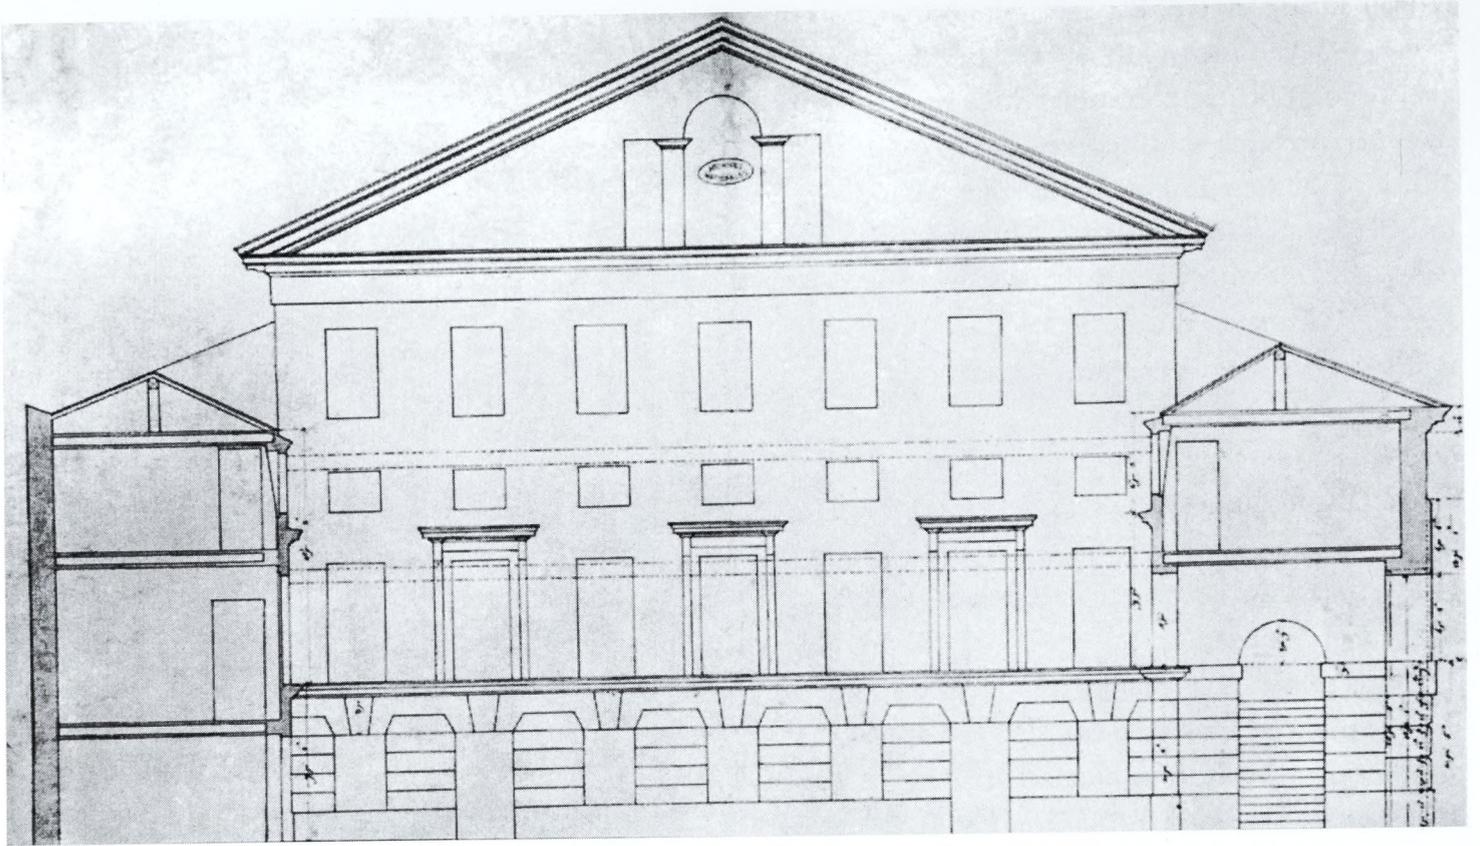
C-N Ledoux, proposed street elevation of house for J-B Hosten, Paris. *Michel Gallet.
